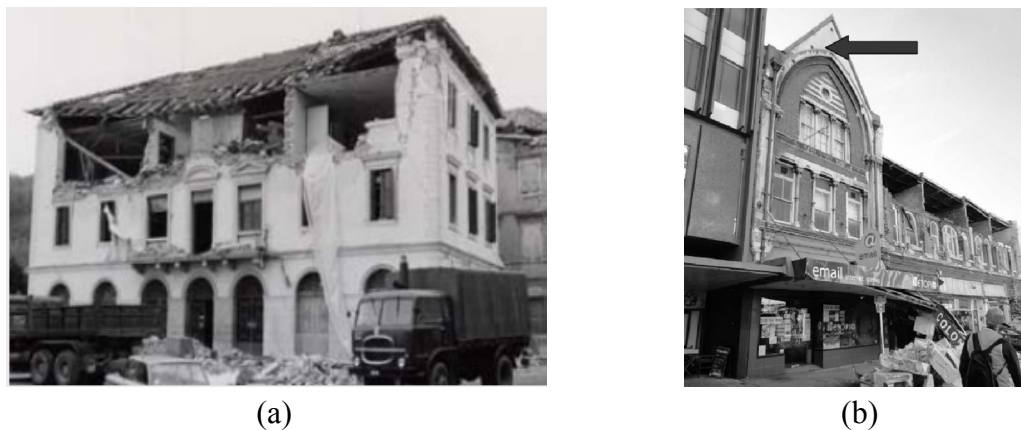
Example of out-of-plane collapse mechanisms: (a) wall of the top floor (Lagomarsino 2012); (b) parapet and wall collapse and successful strengthening with ties (arrow) (Ingham et al. 2011).
